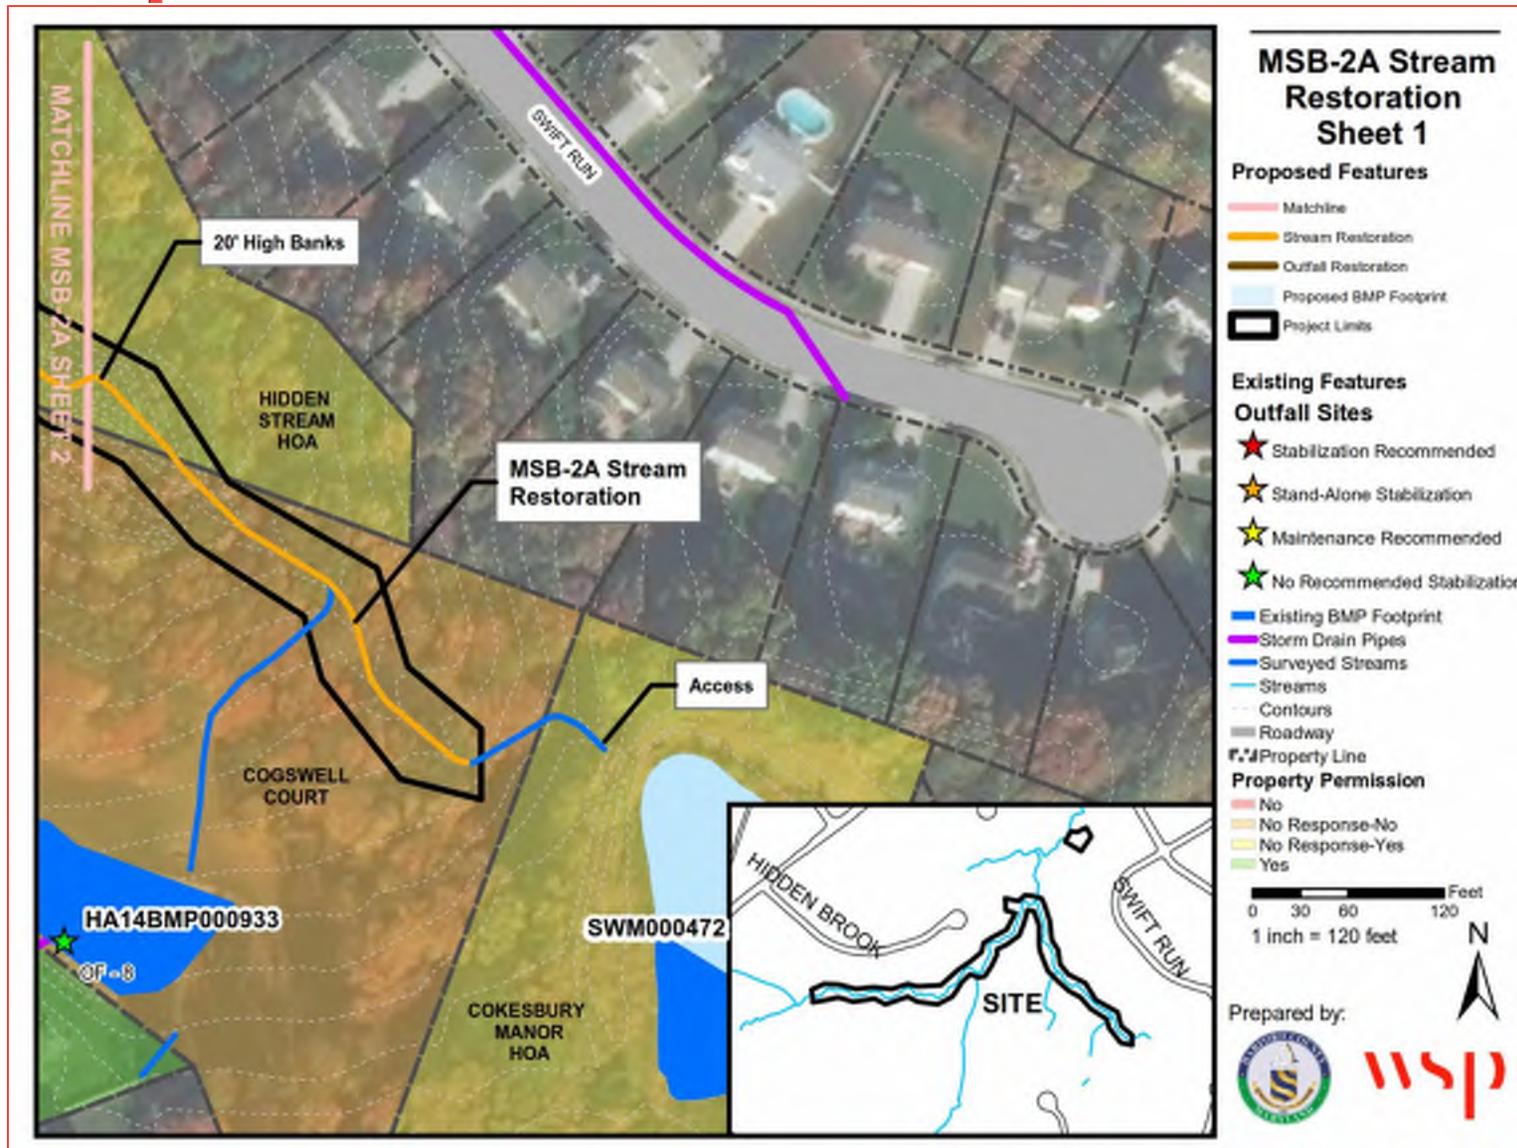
Site Location and Proposed Project Plan for MSB-2A Stream Restoration (Sheet 1 of 3)
